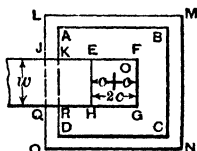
Square Supporting Area. Isolated Load on End of Wall
